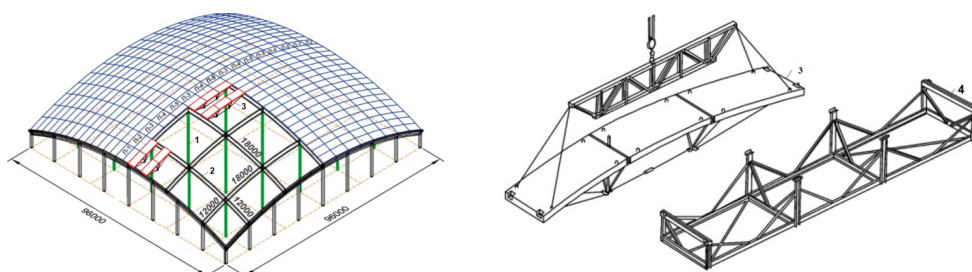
Erection stages of large-span shell coverings using enlarged mounting elements: 1 – temporary posts; 2 – cross stiffening beams; 3 – enlarged mounting elements; 4 – assembly stand
